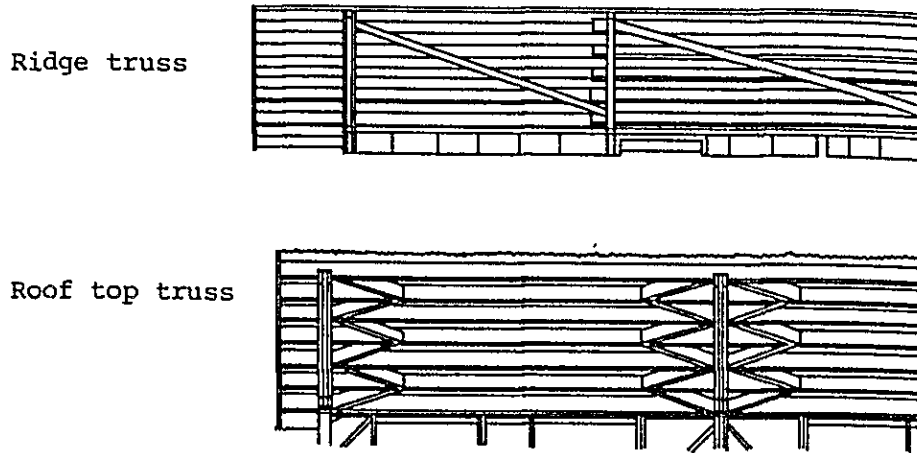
TRUSS REINFORCEMENT SYSTEM IN PERUMNAS HOUSING
